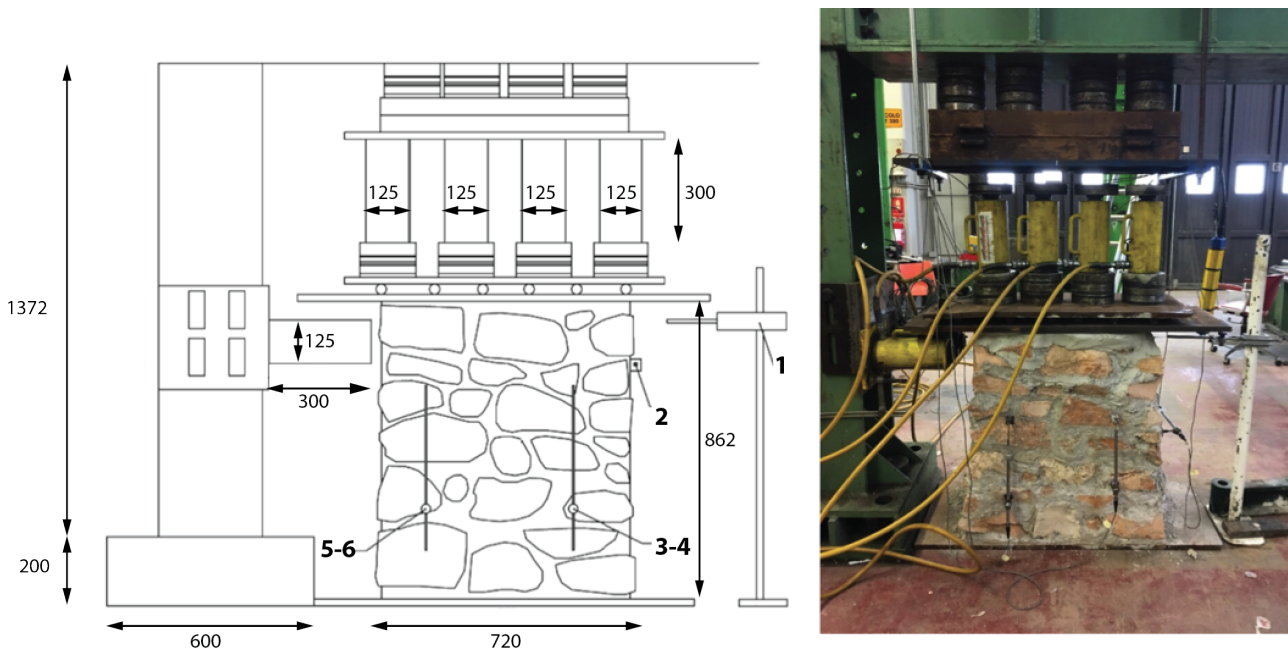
Load bearing - shear apparatus with matrix specimen (measures in mm).
